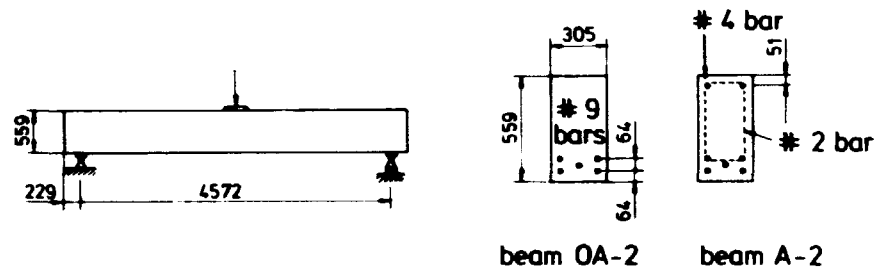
Geometry, loading and reinforcement arrangements for the beam without shear reinforcement (OA-2) and the beam with shear reinforcement (A-2).
